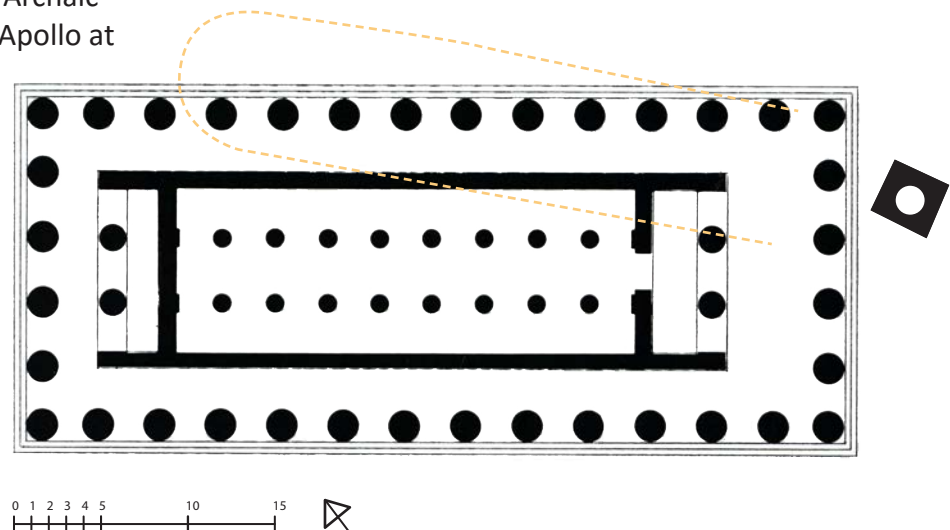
Plans showing the transition from hearth house to temple at the Temple and temenos of Apollo Daphnephoros site at Eretria
